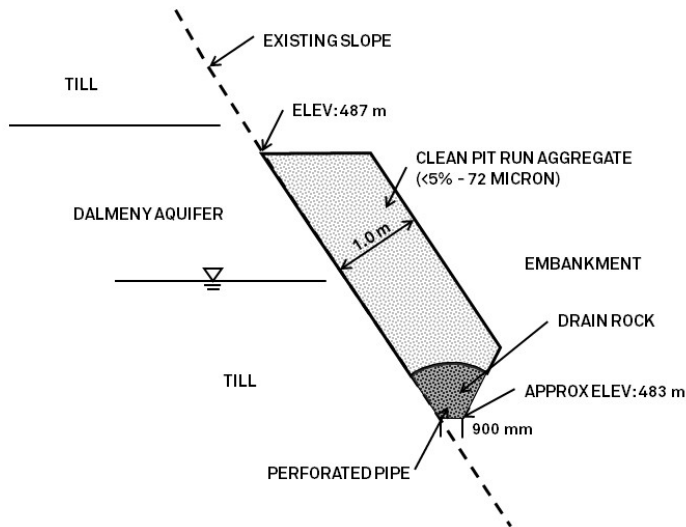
Typical seepage collection system detail at west valley wall, North Commuter Parkway, Saskatoon, Canada.
